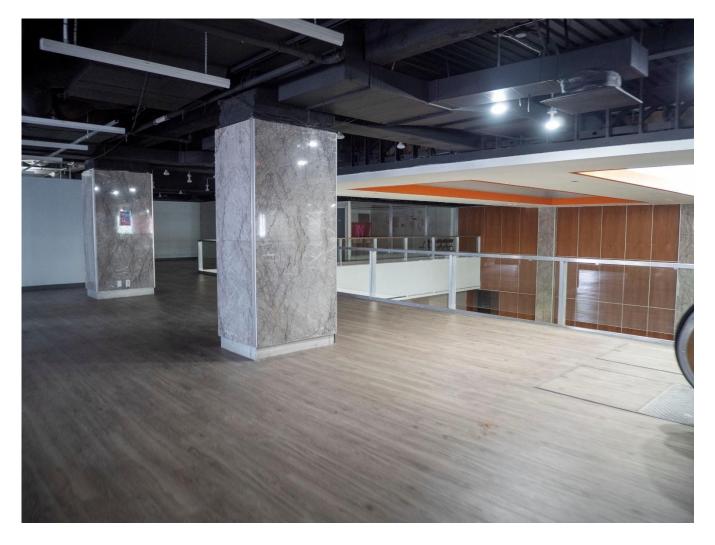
First Wichita National Bank mezzanine level. View northwest.
